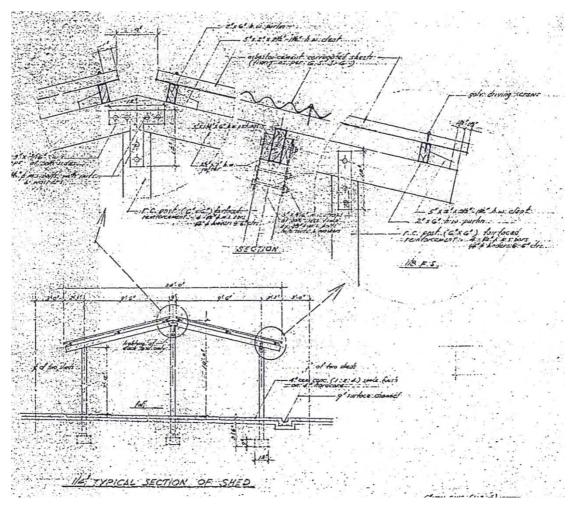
1965 part enlarged record plan of the cattle depot concrete zone
